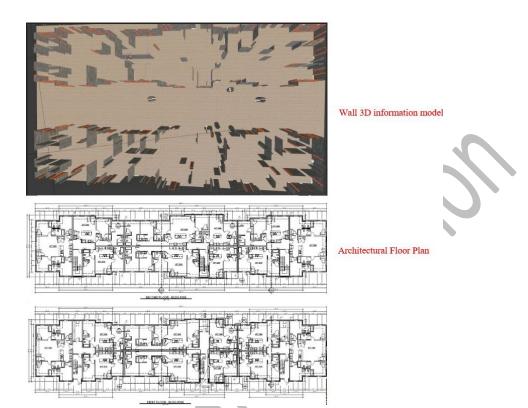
Plan view of the wall 3D information model and the architectural floor plan. CONCLUSIONS, LIMITATIONS, AND FUTURE WORK
